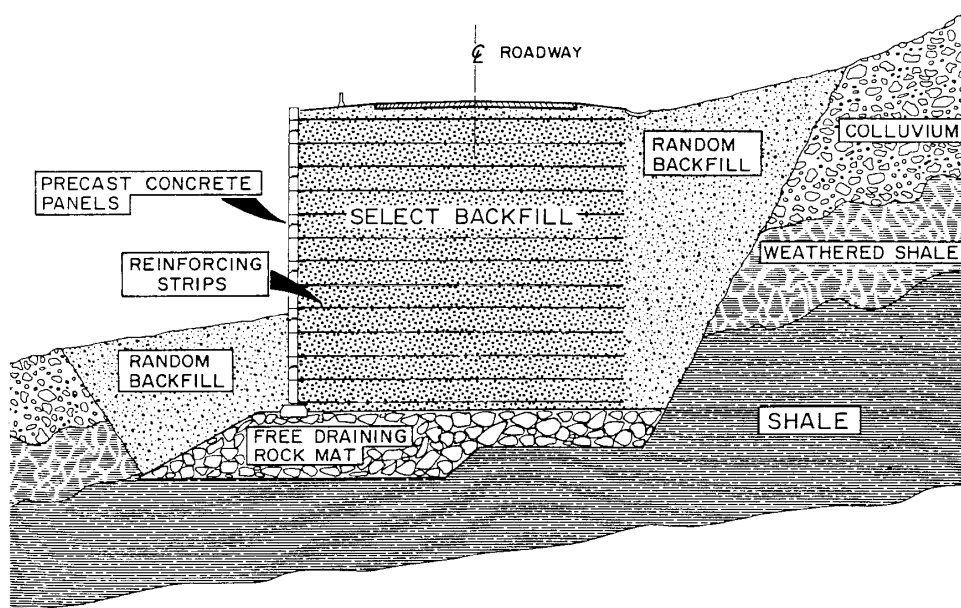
A section view of the reinforced earth structure shown in Photo 39. # (Royster, 1982)
